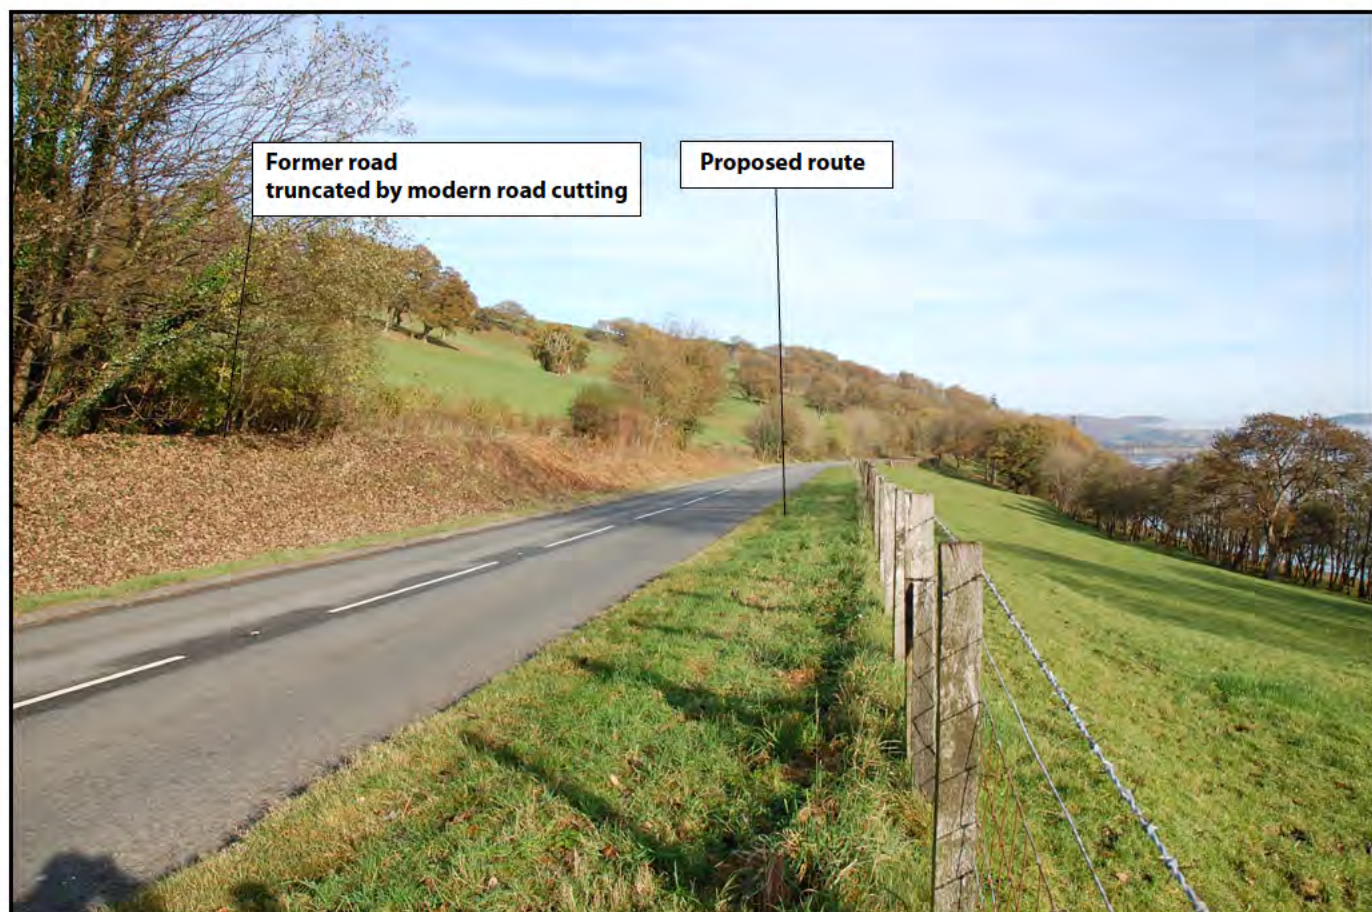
View northeast along the verge denoting proposed route and detailing modernised road. Note the former road truncated by modern road cutting
